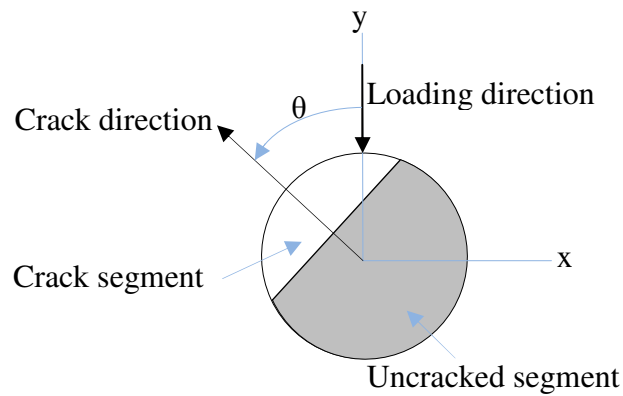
A cross-sectional view of rotating angle (θ) between crack and loading axis
